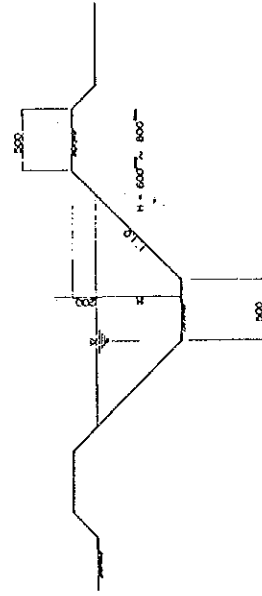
TYPICAL SECTION (CANAL AND ROAD)
